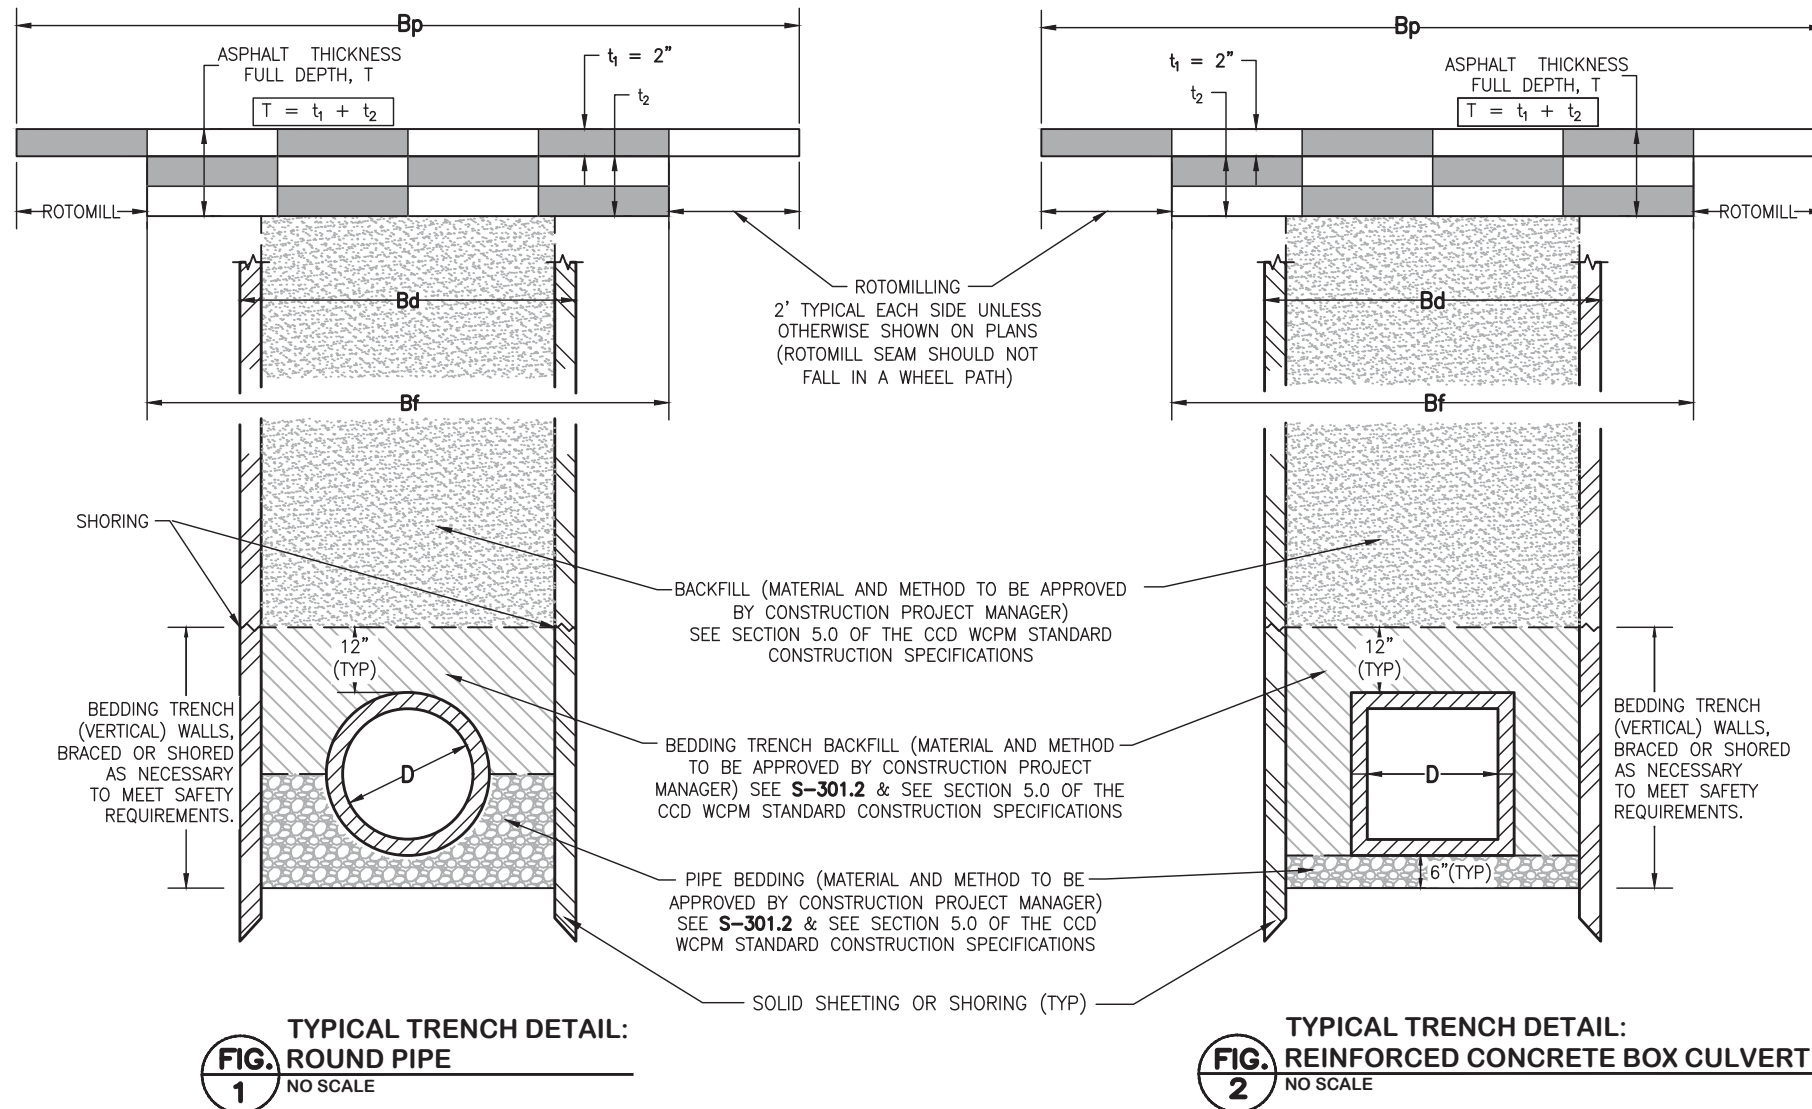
TYPICAL TRENCH DETAIL: ROUND PIPE
